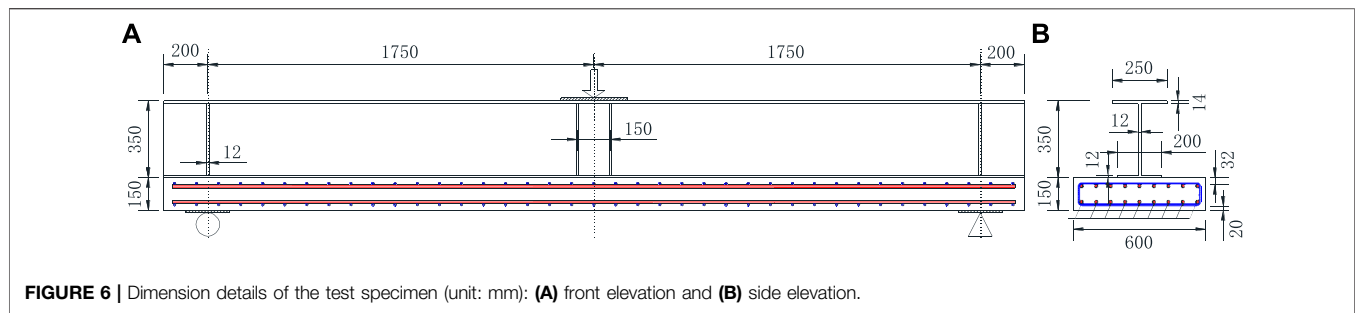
| Dimension details of the test specimen (unit: mm): (A) front elevation and (B) side elevation.
